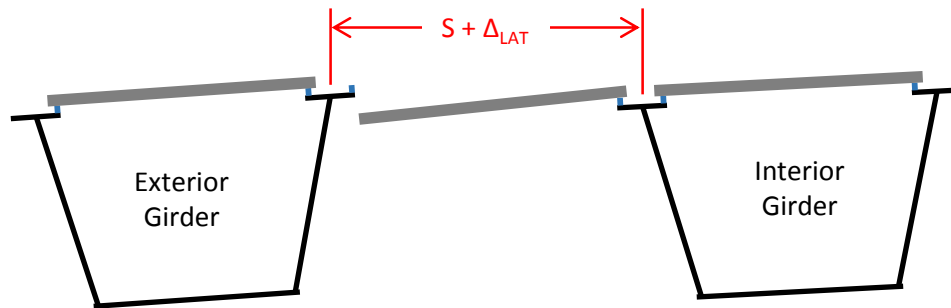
Separation of Tub Girders During Construction without Intermediate External Cross-Frames
